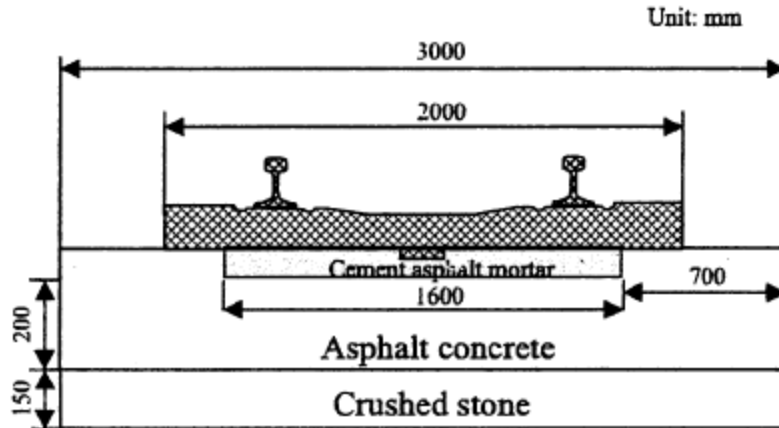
Cross section of the improved solid bed track on asphalt pavement
